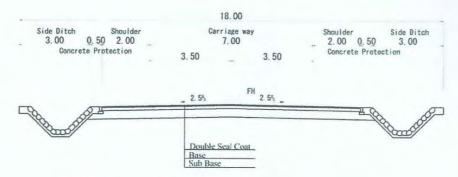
Cross Section of General Section (Rural Area No.2+0 - No.23+600)
